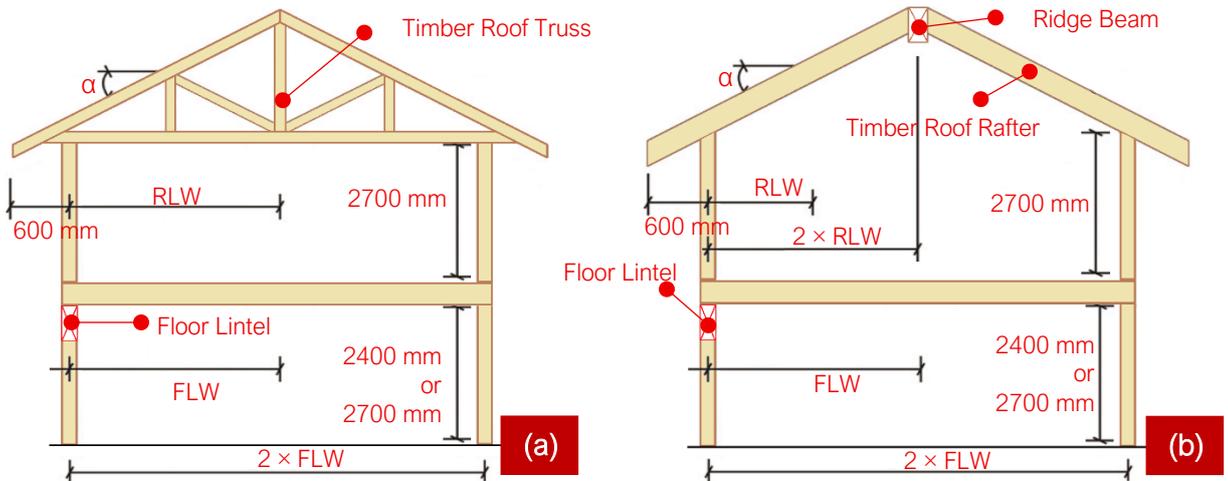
Red Stag Vertix₁₀ floor lintel beam; a) Timber roof truss, b) Timber roof rafter.
